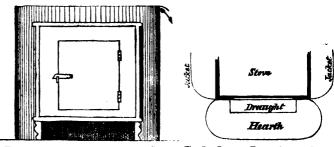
ELEVATION OF FRONT PART OF STOVE, Fig. 5.—PLAN OF FRONT PART OF STOVE, SHOWING FITTING OF JACKNT. SHOWING FITTING OF JACKET.
